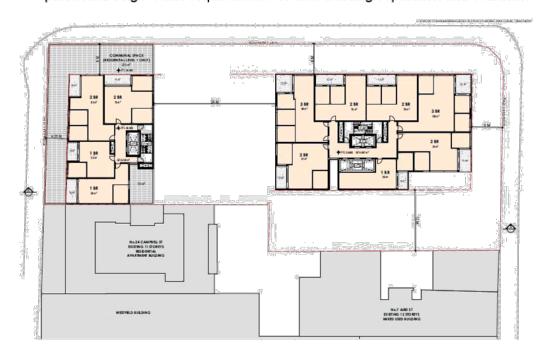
Extract from reference design showing relationship of tower and building forms to site boundaries
